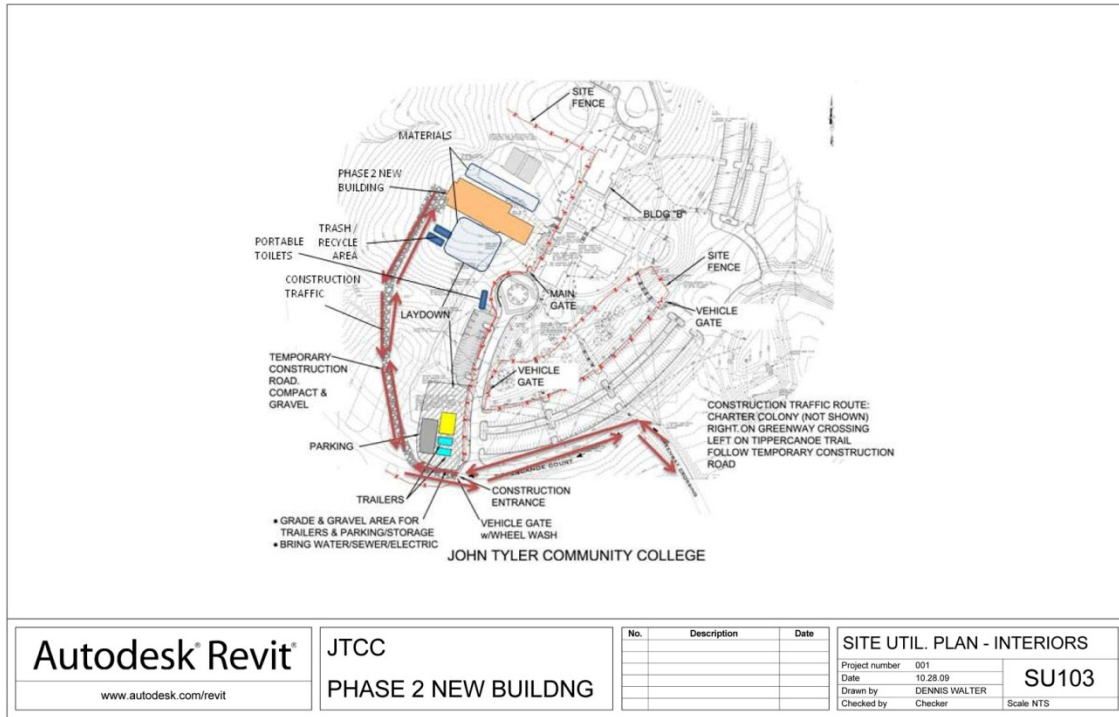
, Site Utilization Plan for Interiors Trades' Phase
